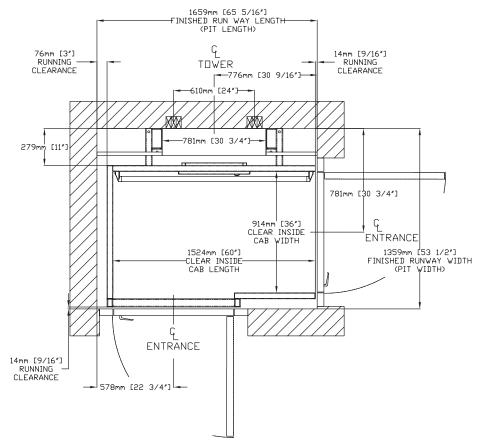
Plan View - Type 3, 36" x 60" Cab, Enclosure Application
